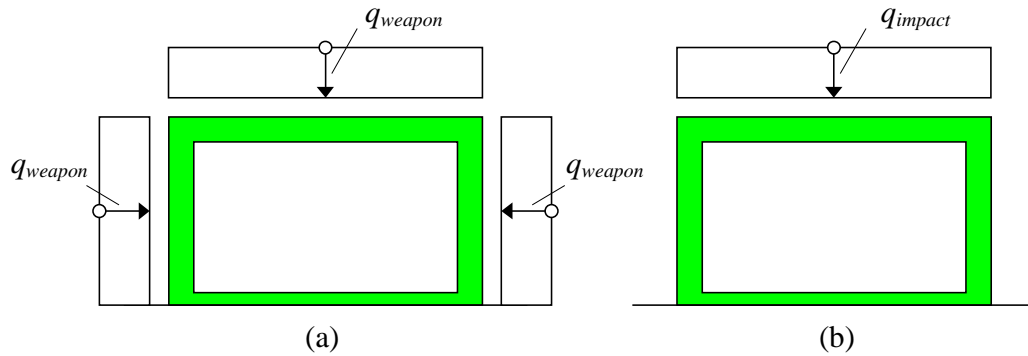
Equivalent static loads used in the design of a shelter: (a) weapon load; (b) impact load.
